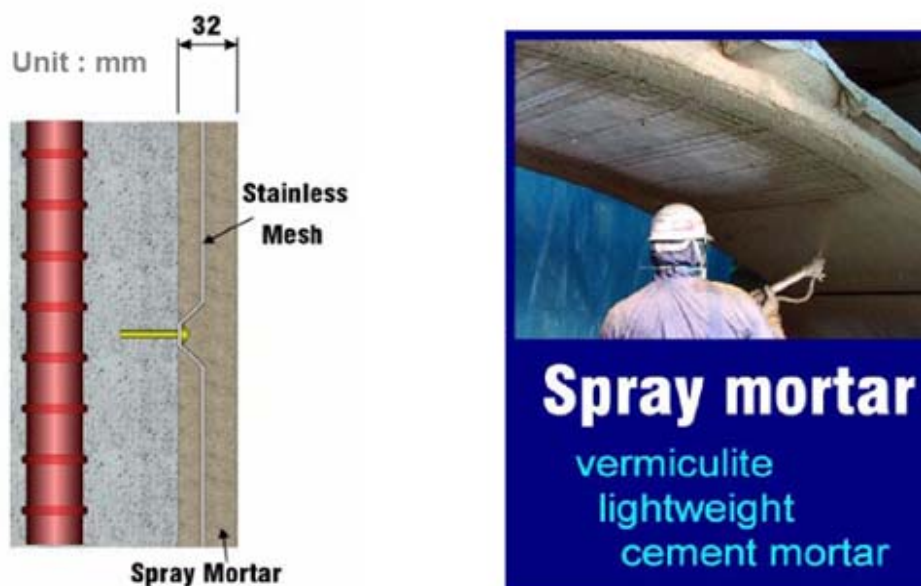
Tunnel fire protection: Secondary layer type (spray mortar)
